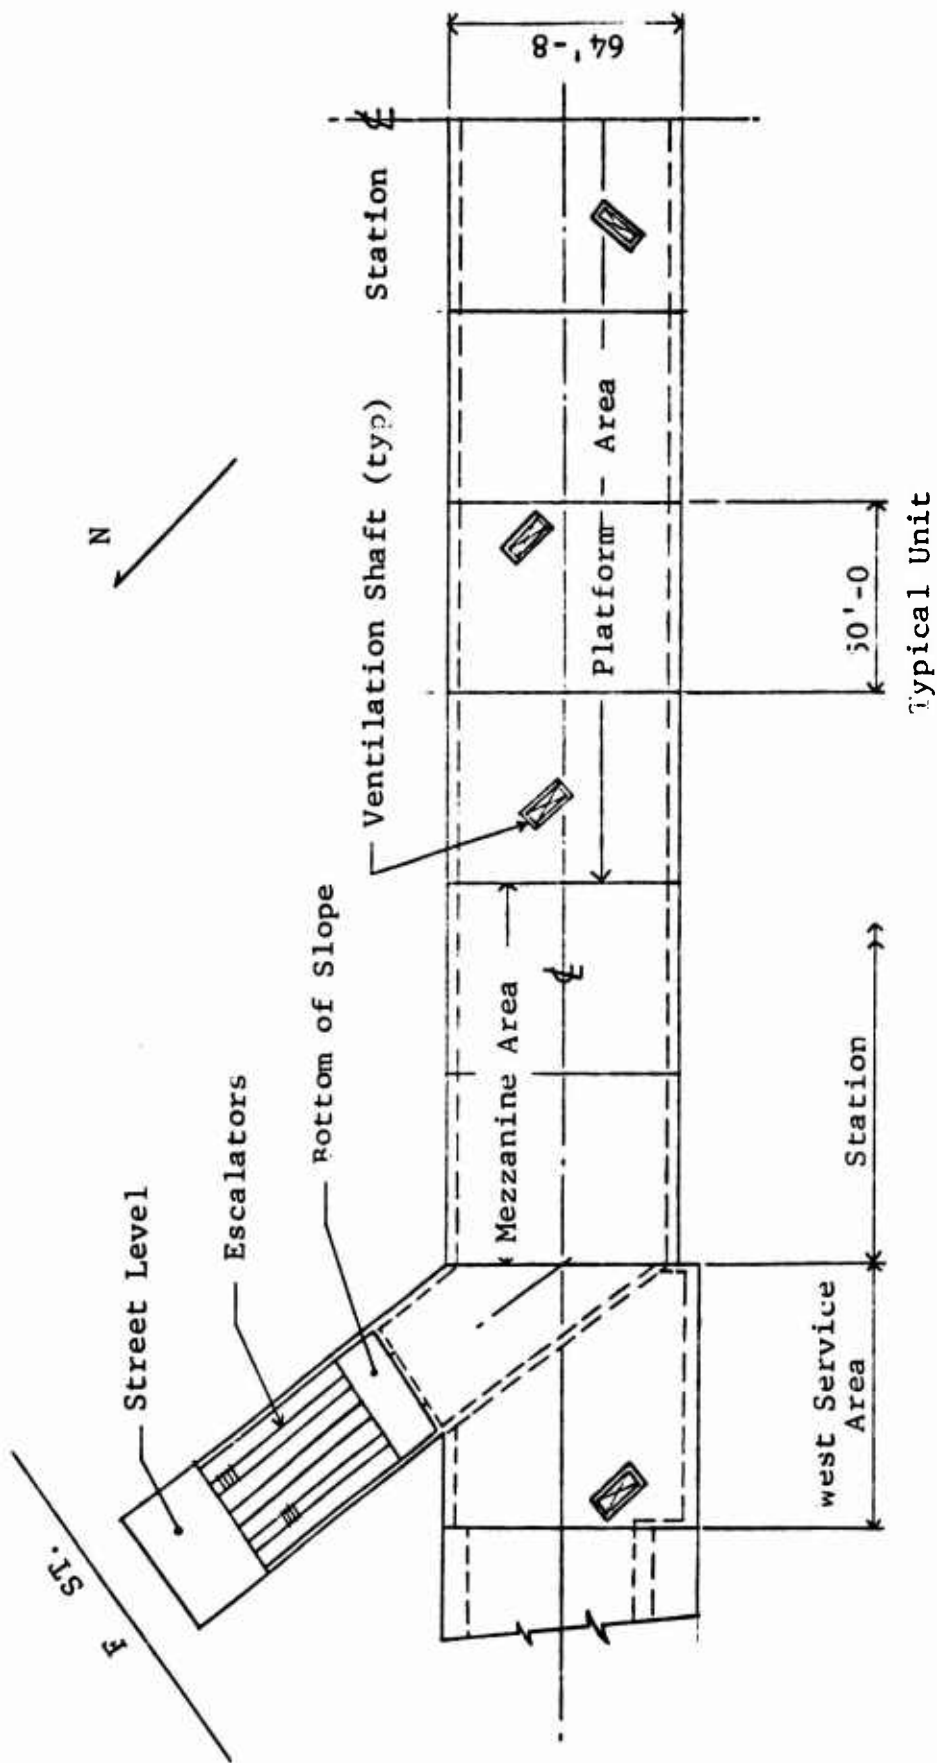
JUDICIARY SQUARE PASSENGER STATION, ROOF PLAN (HALF SECTION)
